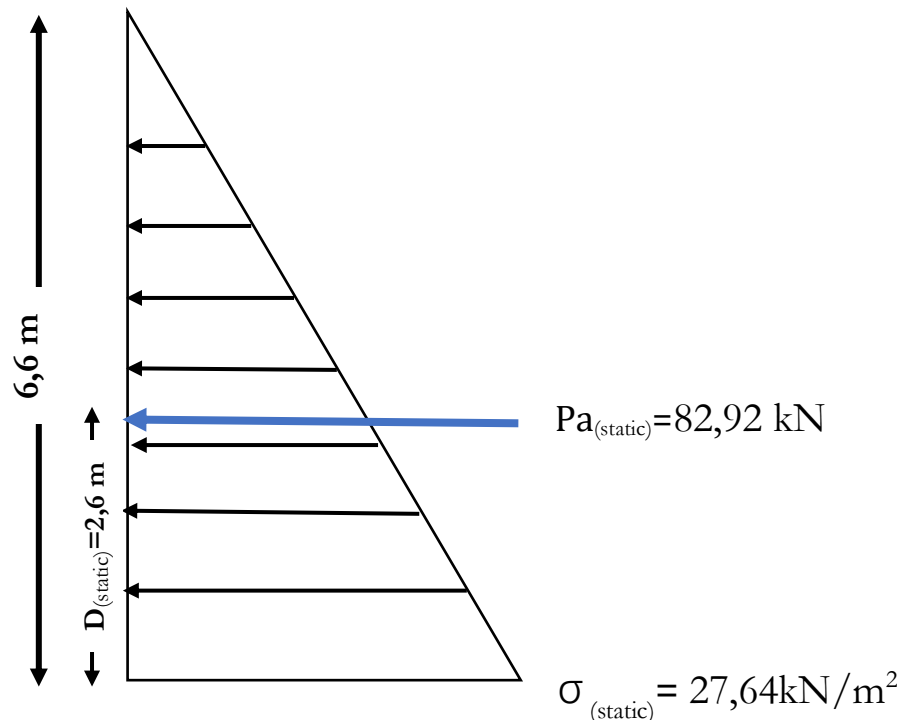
Static Lateral earth pressure for the Cantilever Retaining Wall.
